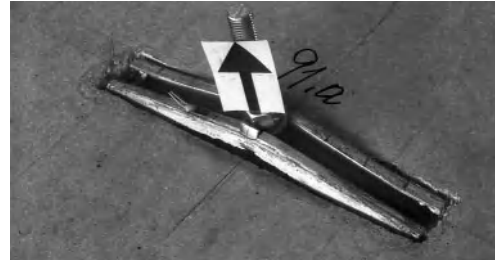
Photo of an anchor channel after test; failure by distortion of anchor flanges (Wohlfahrt (1996))
